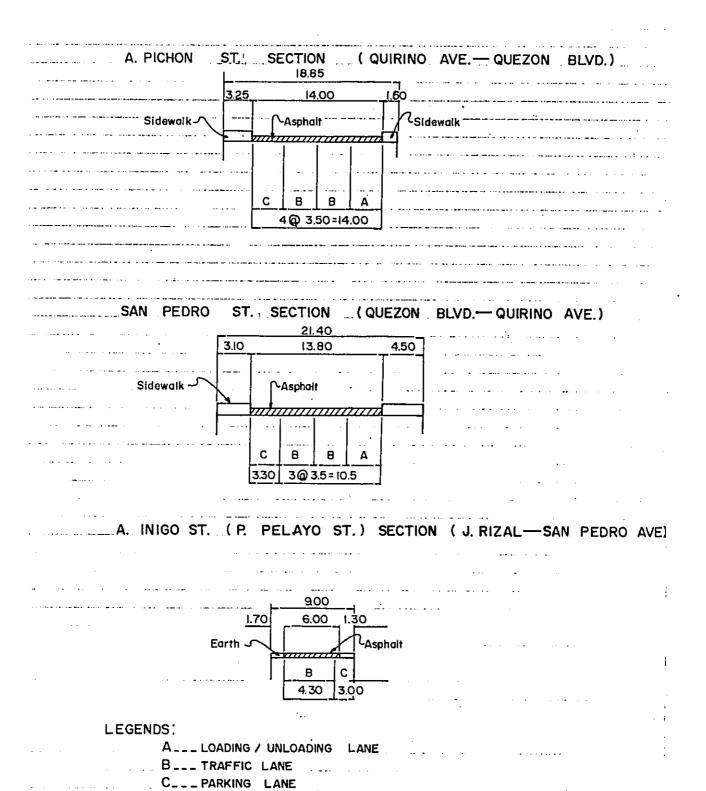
CROSS SECTION OF ONE-WAY ROAD AND UTILIZATION OF ITS ROADWAY
